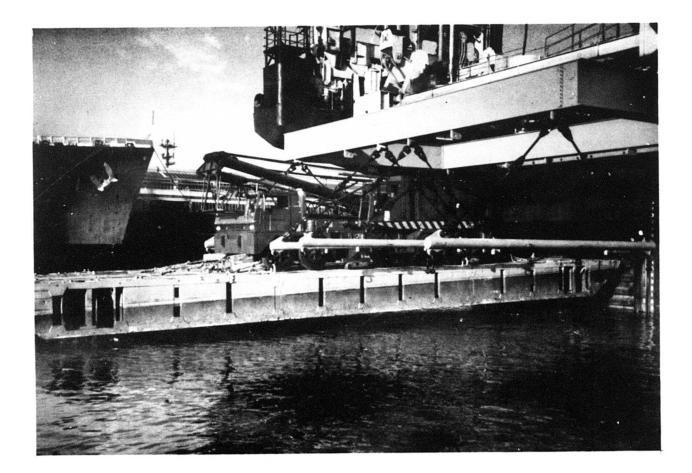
140-Ton Crane on ELCAS Pierhead Section (Lift 4)
